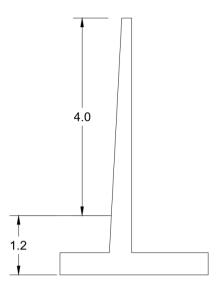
Cantilever retaining wall (Depth of foundation)
